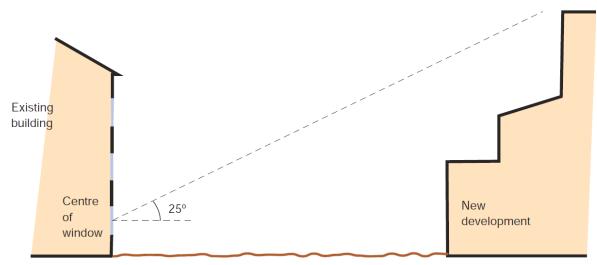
Section perpendicular to a main window wall of an existing building showing a new development
